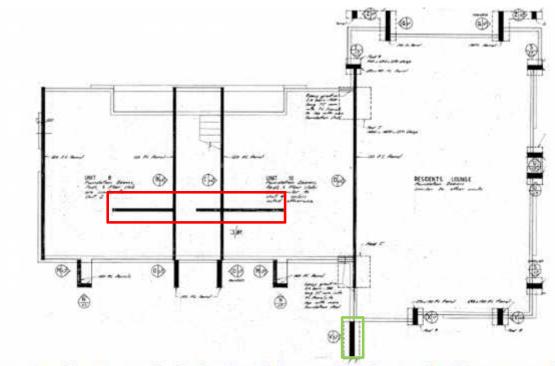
Locations of strengthening brackets (red rectangle) and replaced wall (green rectangle) in Block B.
